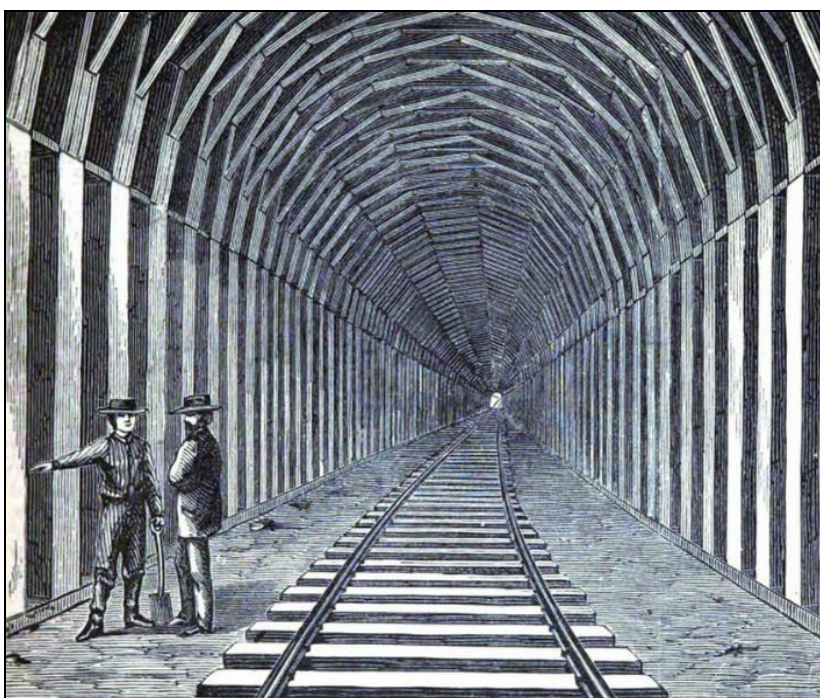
Engraving of original timber lining in Livermore Pass Tunnel. The 1,160-foot tunnel was dug with manual labor. The timber lining was replaced with concrete in 1909 (Croft 1879).
